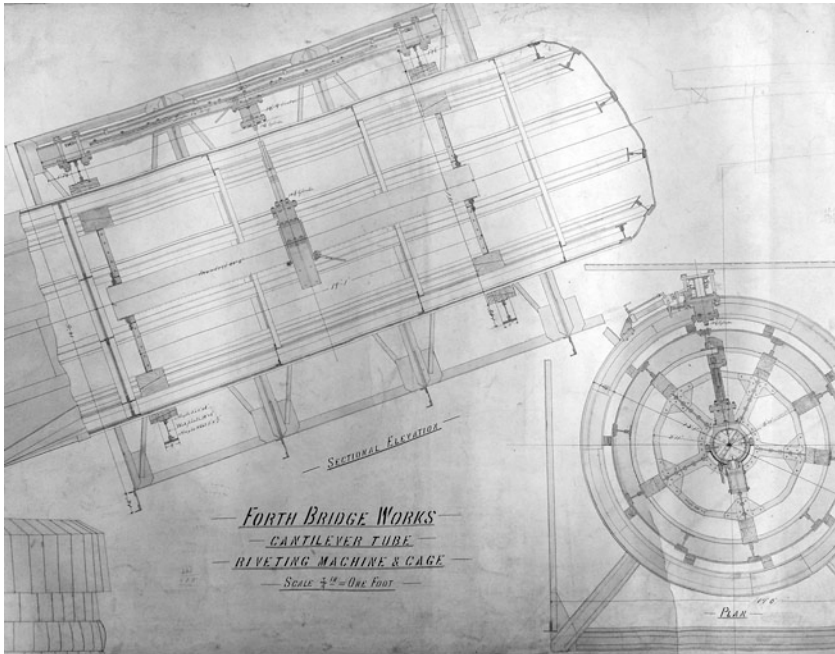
Riveting machine and cage for the Forth Rail Bridge by Sir William Arrol & Co
